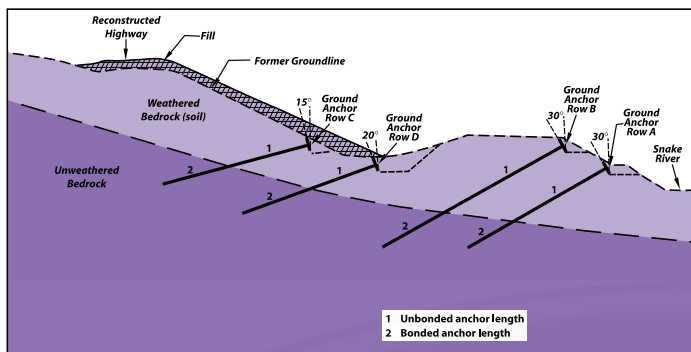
Diagrammatic cross section through the lower part of the Deer Creek Slide showing anchor locations and construction details. Modified from Turner (2001).
